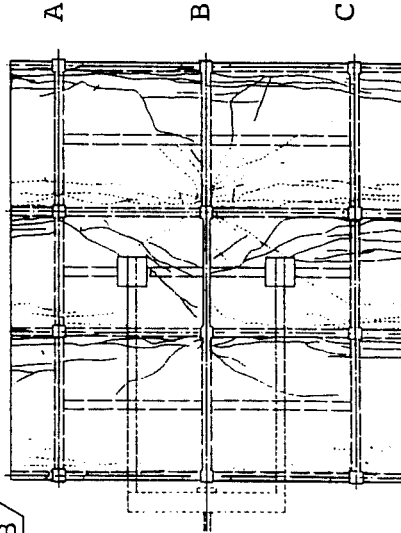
BRI Building Cracking Patterns (PSD 2).
